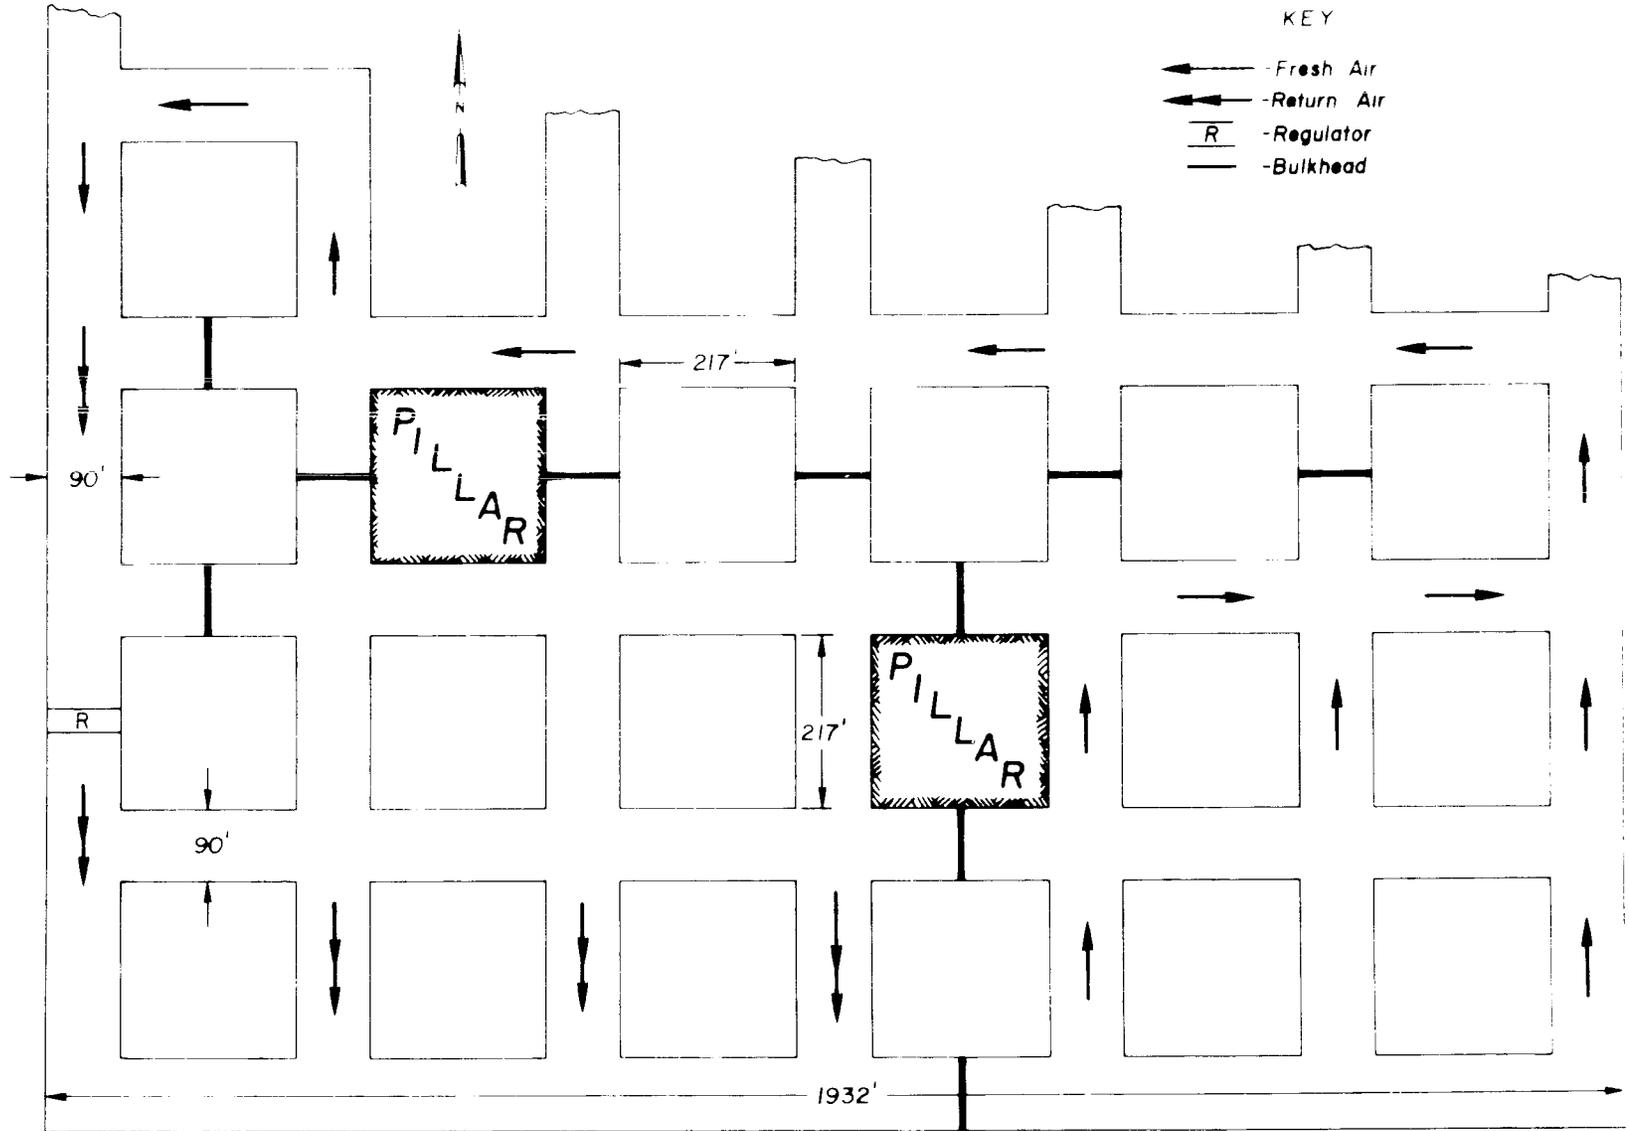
Plan View of Section Ventilation Network, Advance Entry and Pillar Mining
